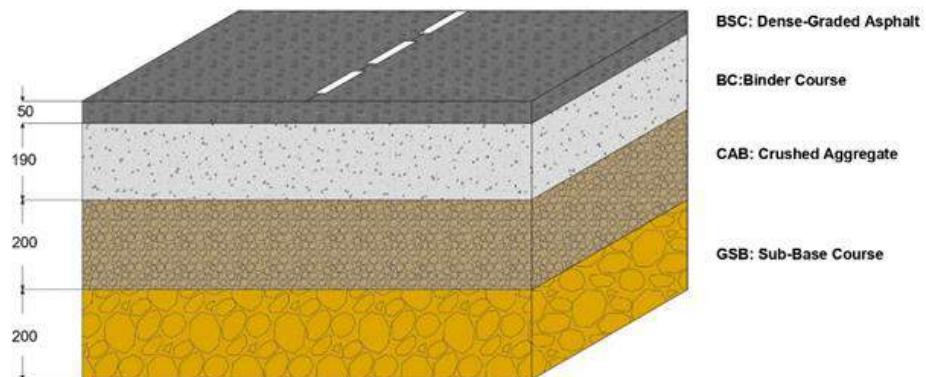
a) Pavement Structural Thickness Layout for T5
